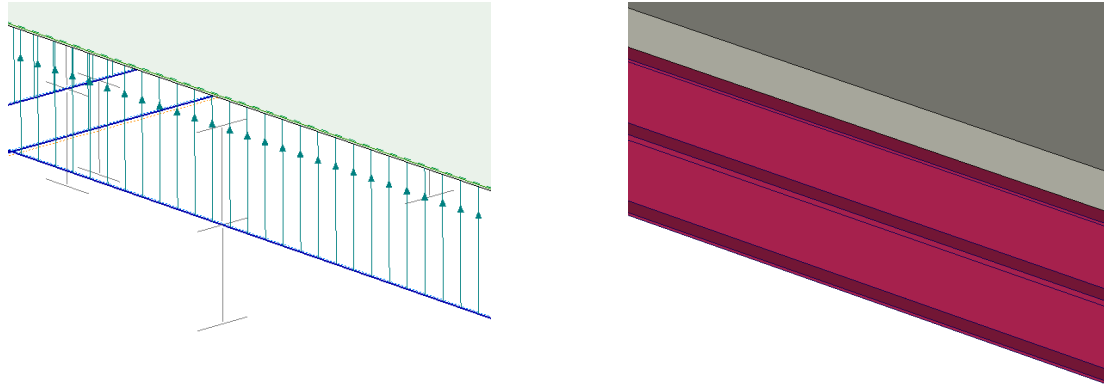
Unique cross-section of the steel beam on which a concrete plate is rested - 1D FEs
